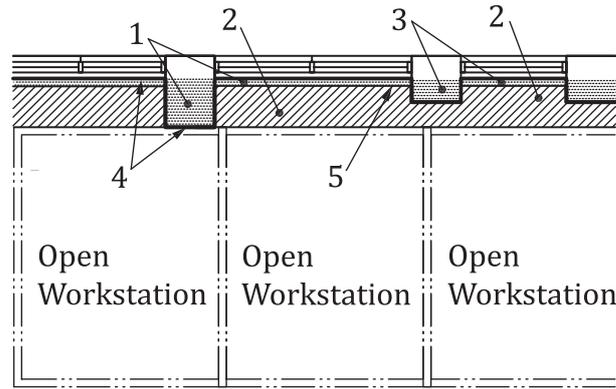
Encroachments of pilasters force workstations to be placed away from the wall
